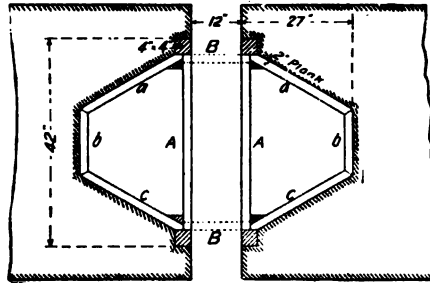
SECTION OF JOINT BETWEEN TWO CAISSONS.
